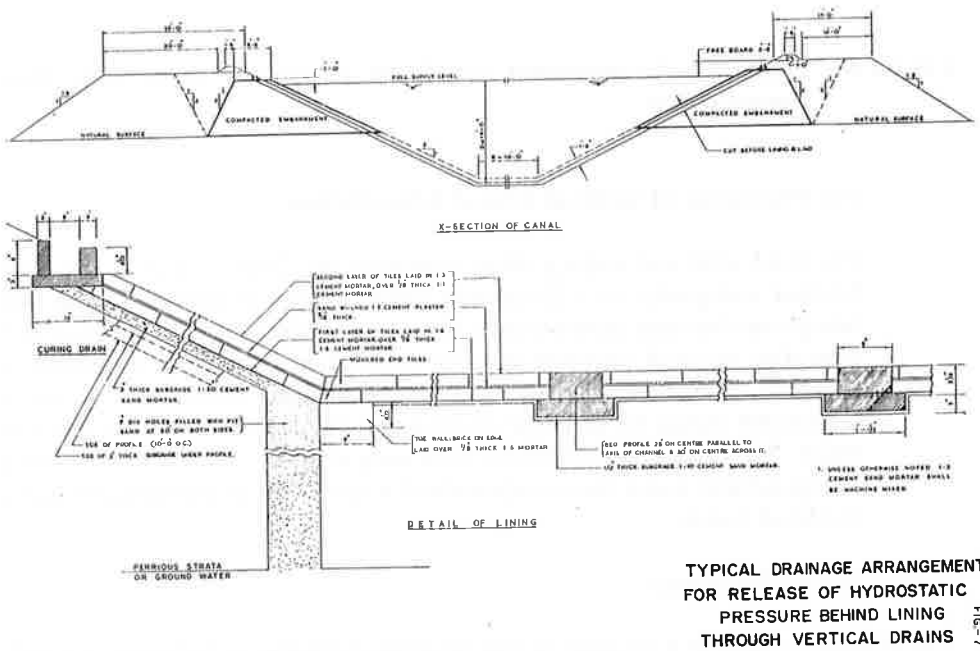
Typical Drainage Arrangement for Release of Hydrostatic Pressure Behind Lining Through Vertical Drains.
